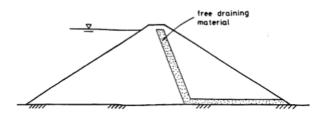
Earthen Dam section with Homogeneous embankment and a Chimney Drain
